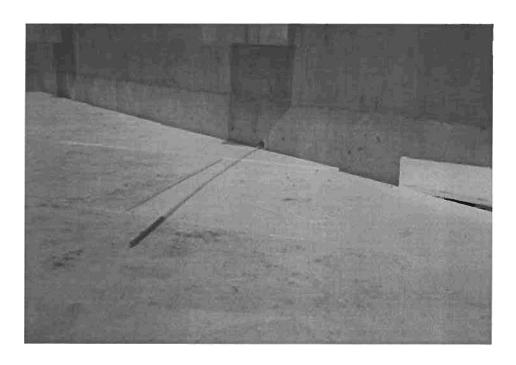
An Extensometer Fiberglass Rod Placed on the top of EPS Blocks
